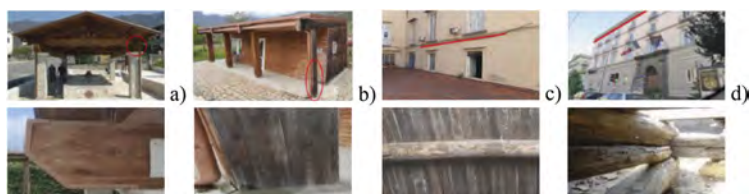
Case studies (specific component): roofing structure a) primary beam; b) column; residential building c) primary beam of the intermediate floor; d) struts and ties of the roof.
